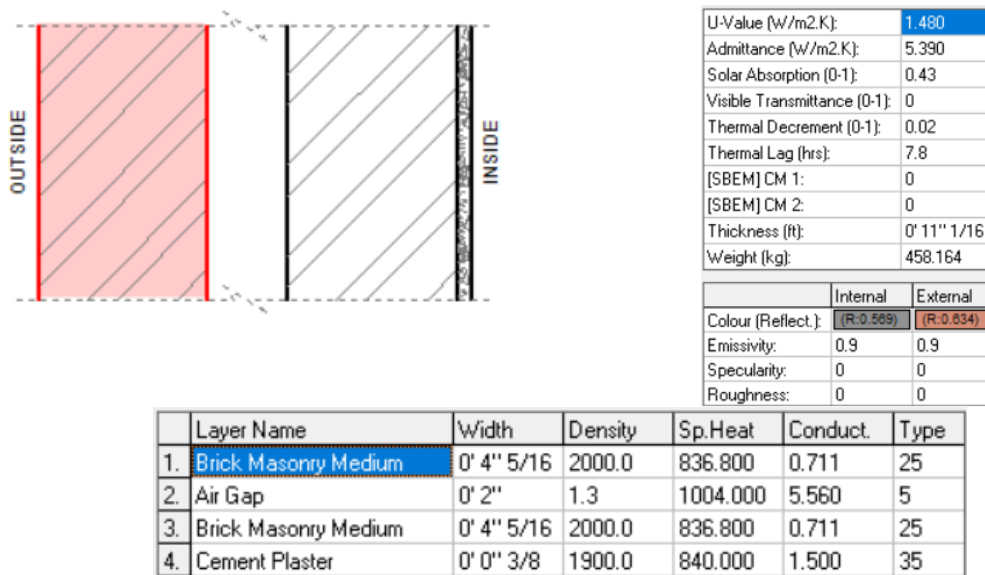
Wall section, properties of material and the layers of material of Brick Cavity wall used in Case scenario 8
